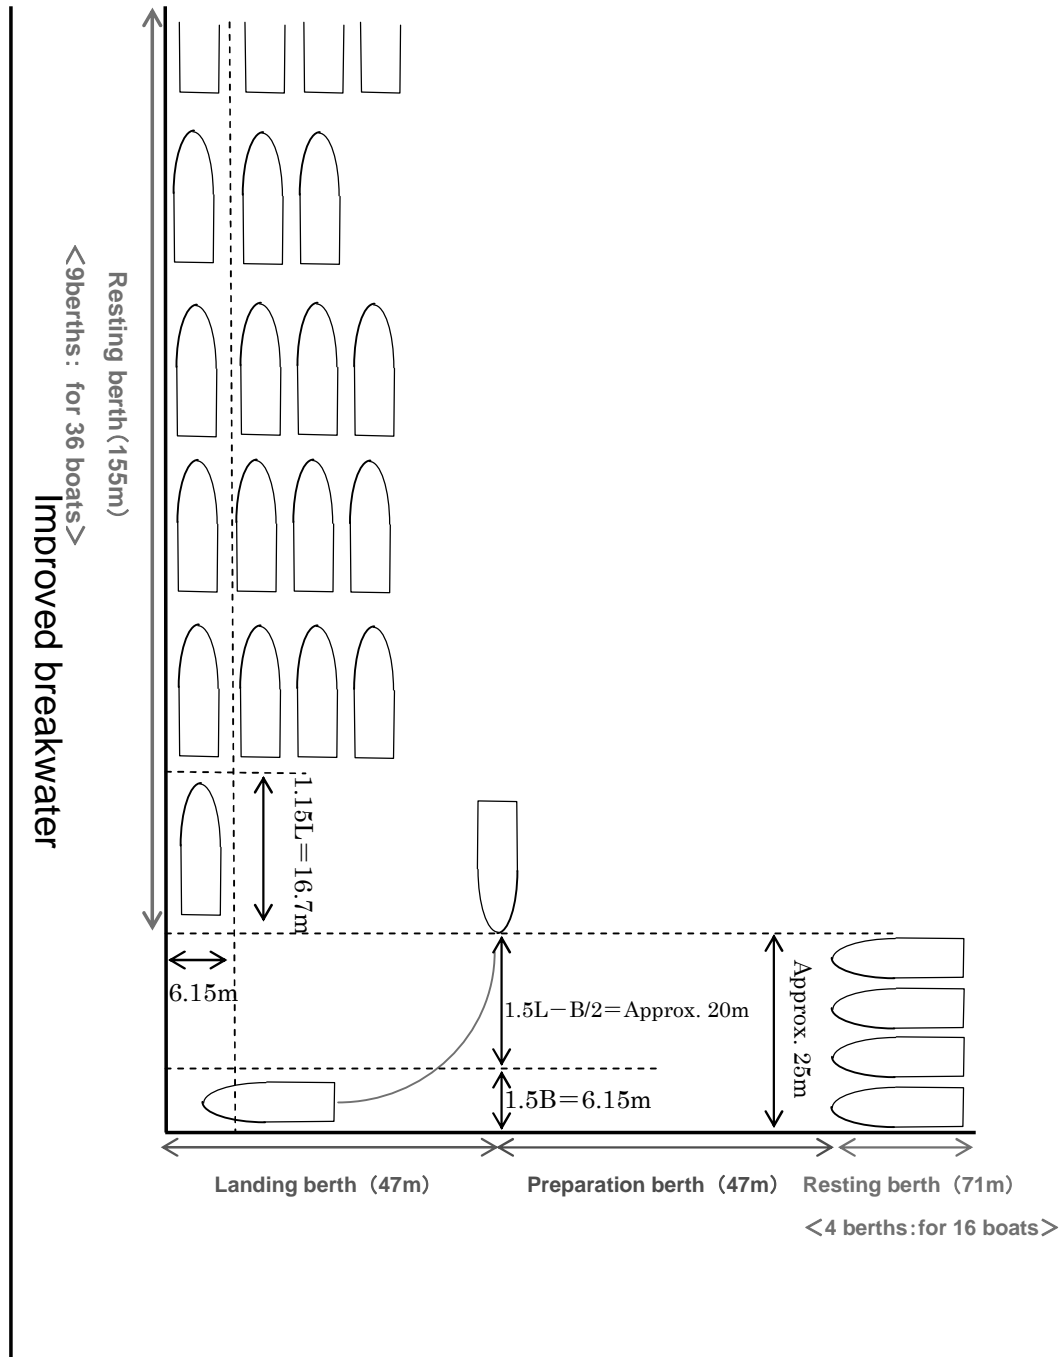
(6) Berth Allocation in Low Season after Breakwater Improvement
